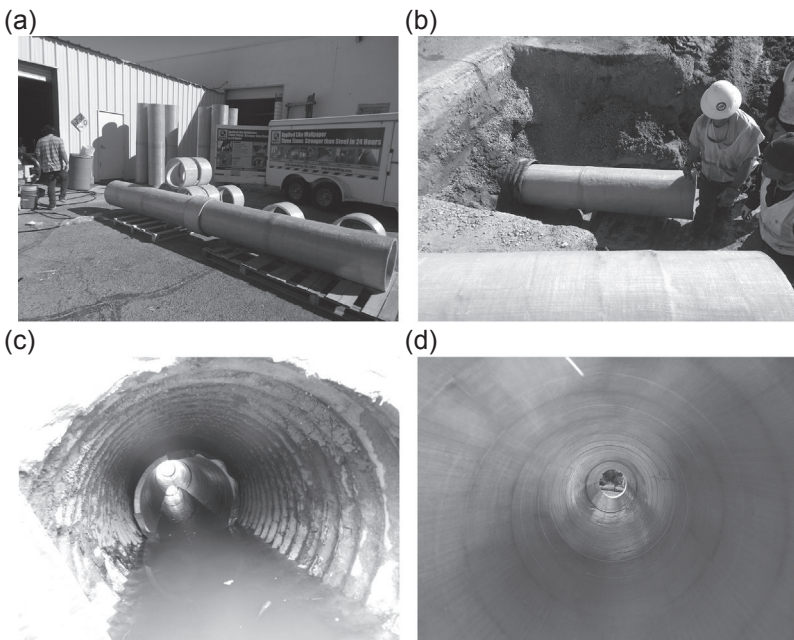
StifPipe[™] used to repair a deteriorated corrugated metal pipe culvert: (a) pipe sections and sleeve connections, (b) pipe being inserted into culvert, (c) standing water in pipe during installation, and (d) inside view of installed pipe.
